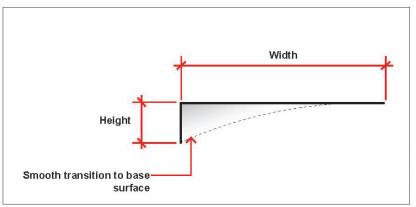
A: FF-1 Upward facing striation elevation
